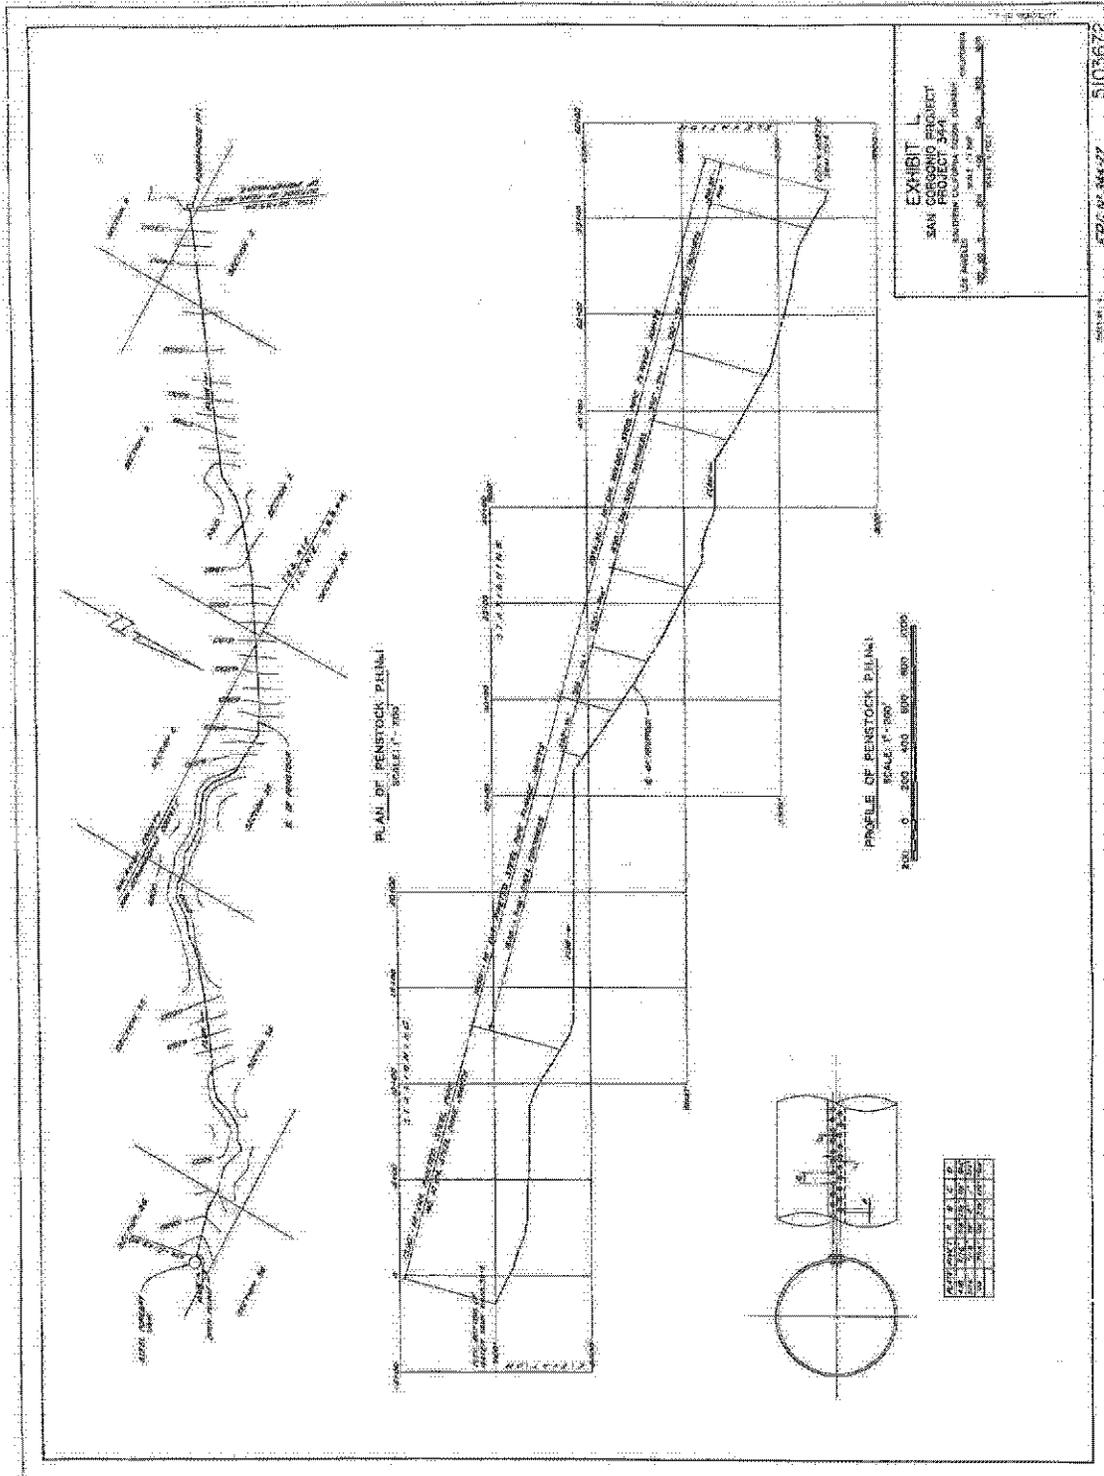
Detail of Tank No.1 and Penstock No.1 taken from previous reduced size plan. Note Tank No.1 is identified as No. 1 Forebay Tank in this plan. Original drawing courtesy of Southern California Edison.
